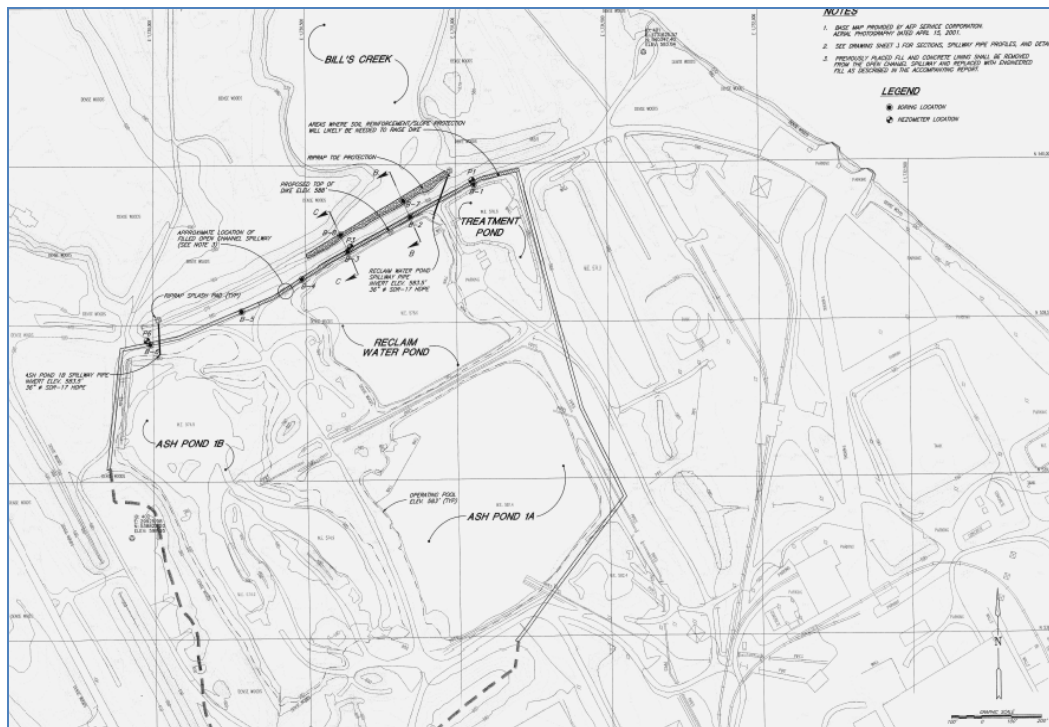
John Amos Bottom Ash Pond Piezometer and Boring Locations for the Dam Modification Study.
